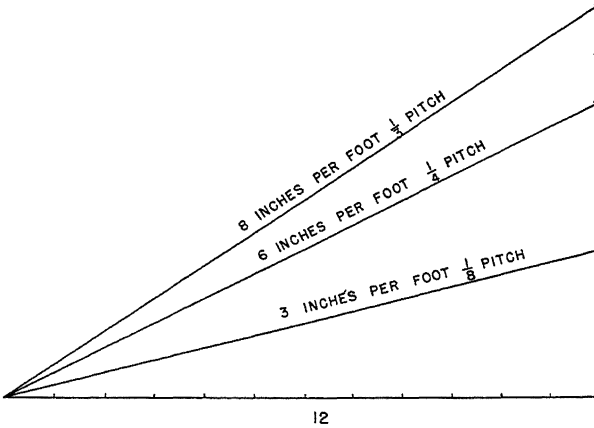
The pitch of a roof is very important in determining whether it will leak or not. Pitches, commonly used, are shown above.
